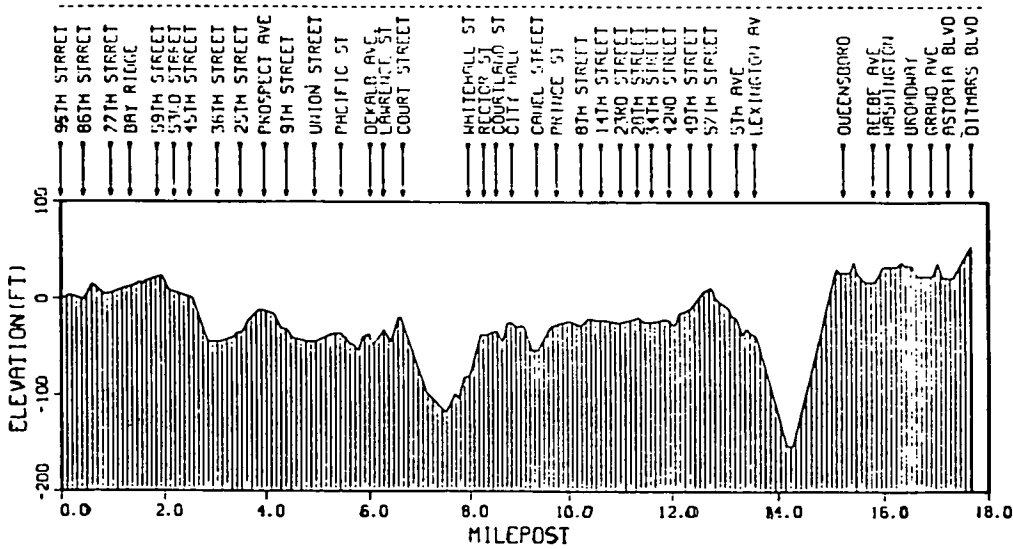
Elevation profile—NYCTA RR Line, northbound.
